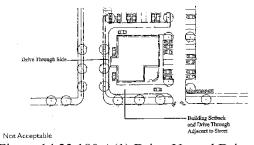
A(1) Drive-Up and Drive-Through Facilities
